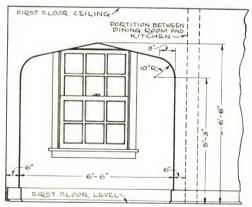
Elevation View Showing Arch Between Living Room and Dining Alcove for House of Fig. 31
